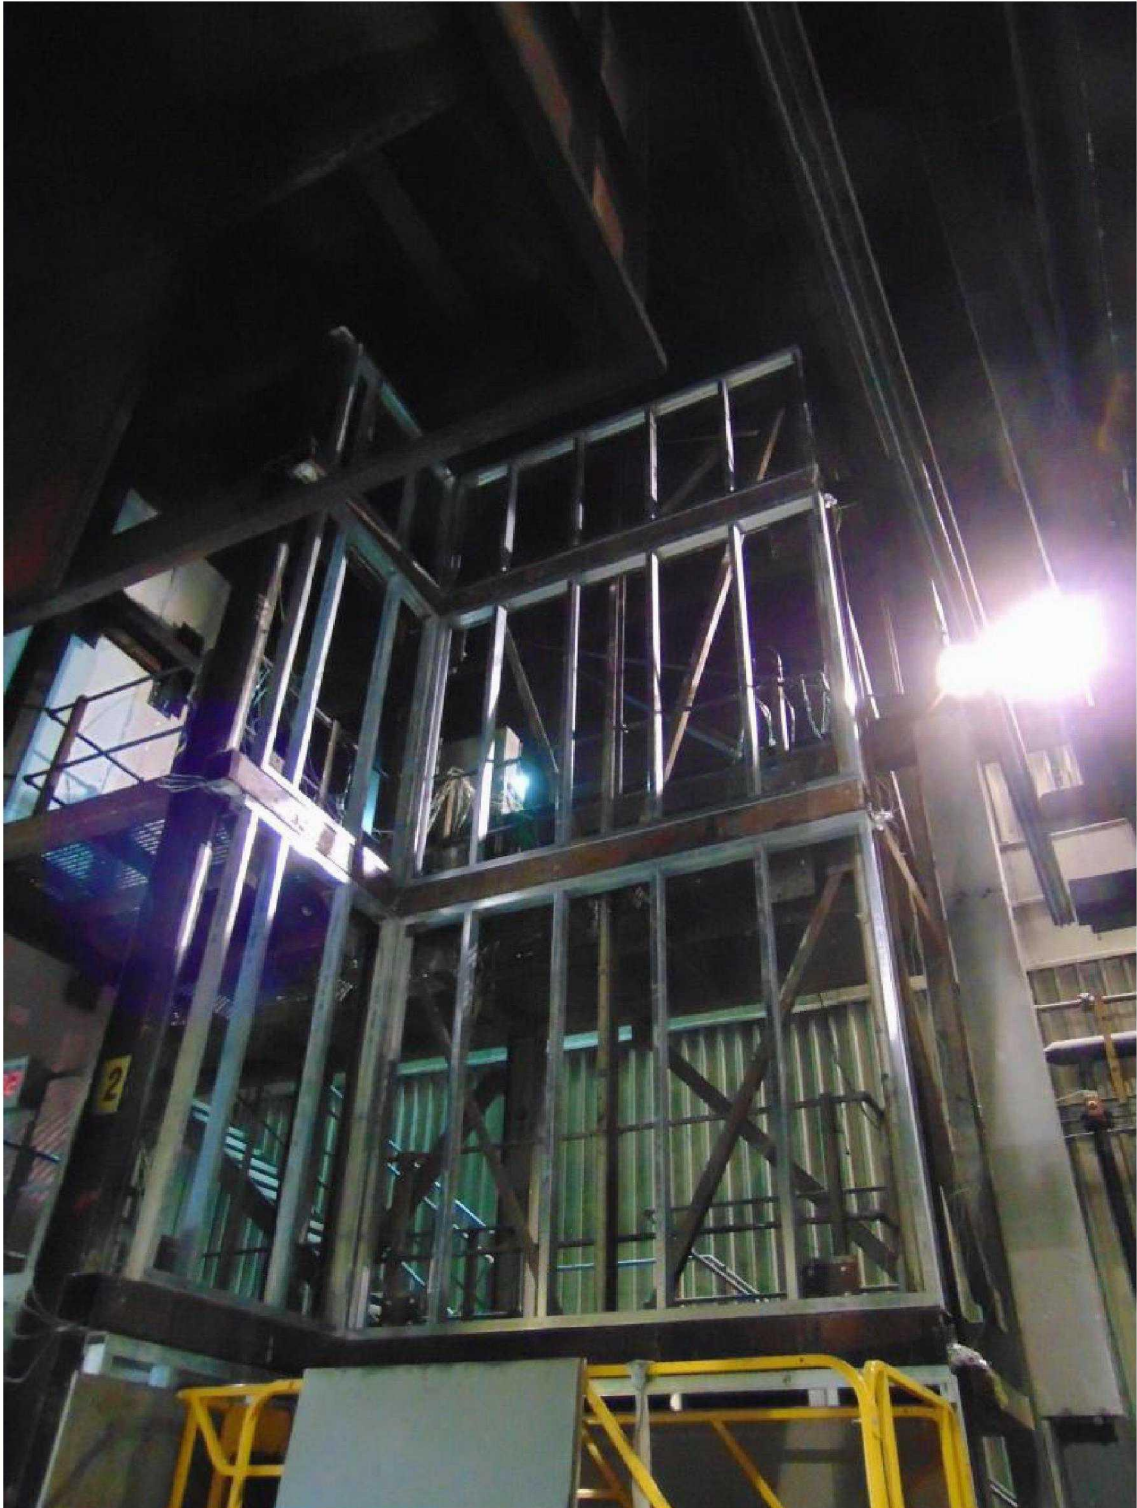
Kingframe SFS (Steel Framing System) fitted between 'floor slabs'.
